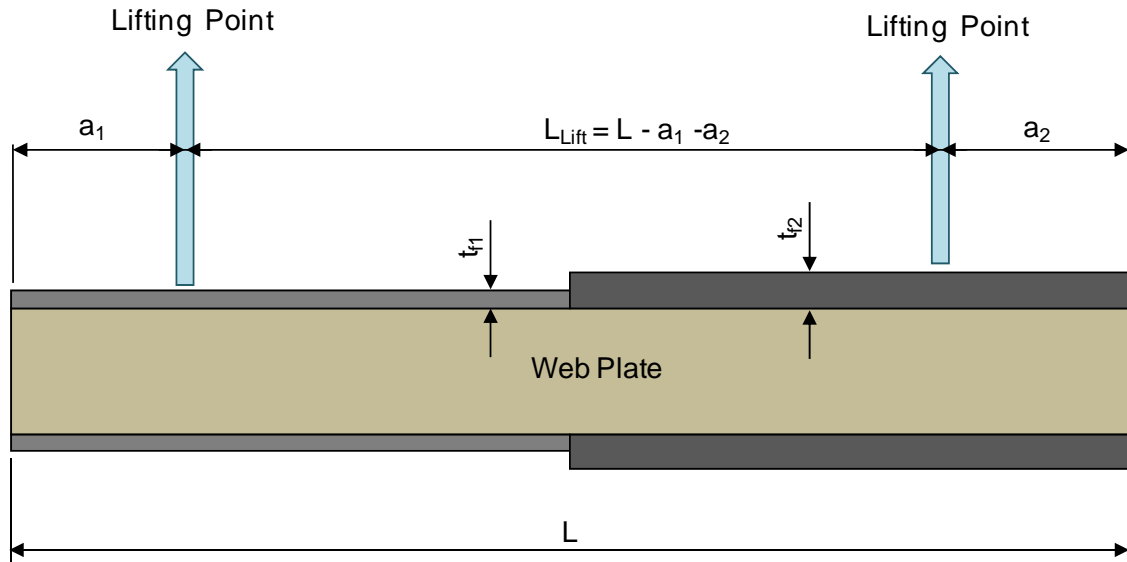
Example Non-Prismatic Girder and Lifting Locations
